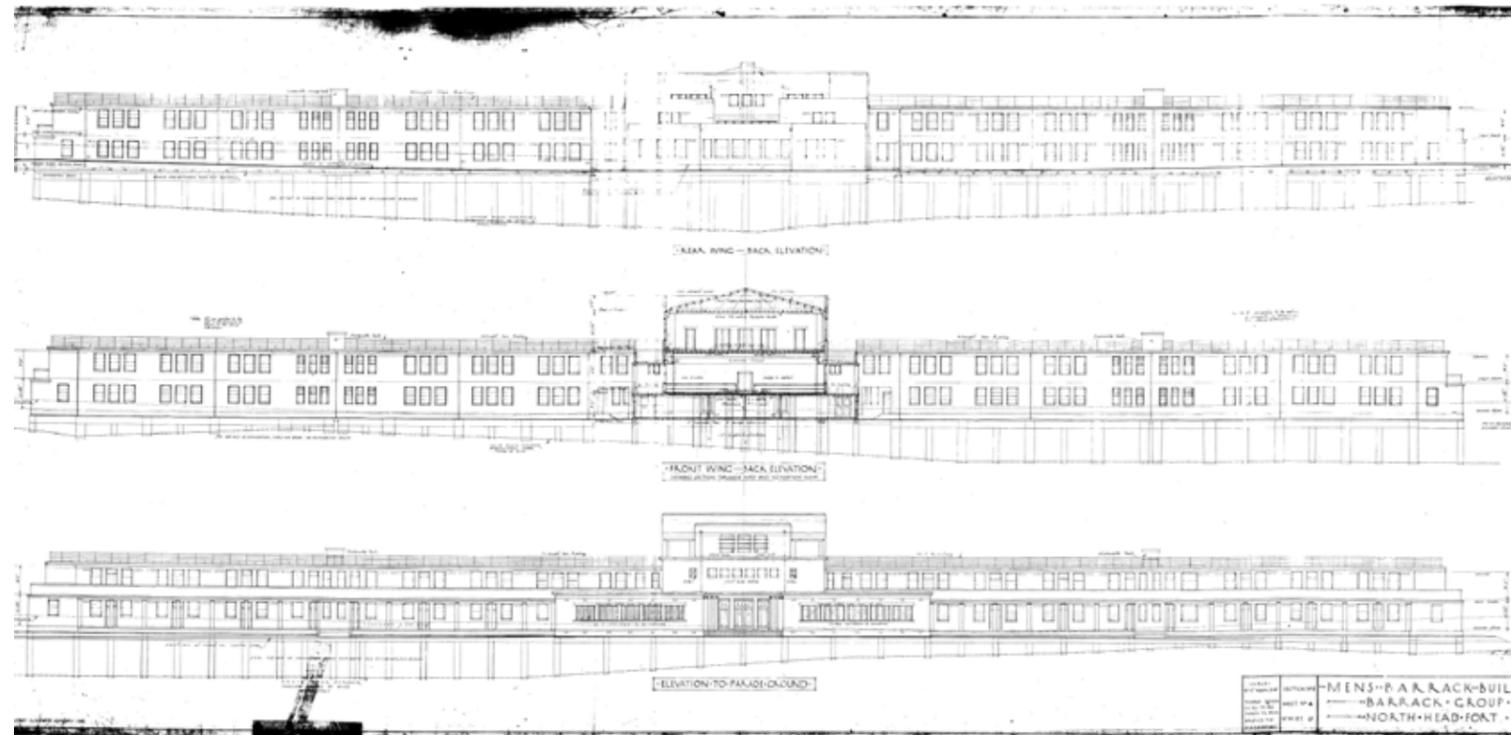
Front and back elevation drawings of Main Barracks Building formerly the Men's Barrack Building. Source: Harbour Trust
